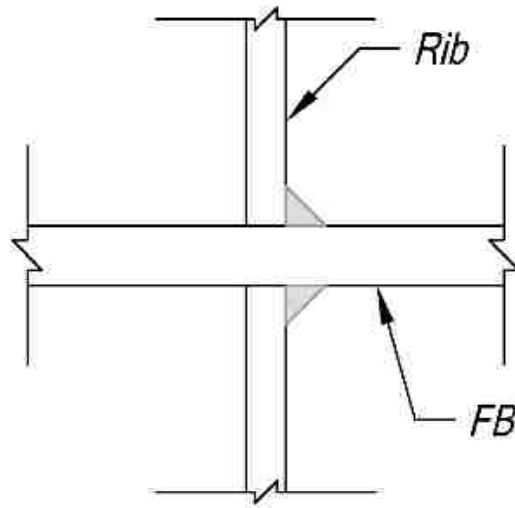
Rib-to-floor beam connection with discontinuous ribs fitted between floor beams
